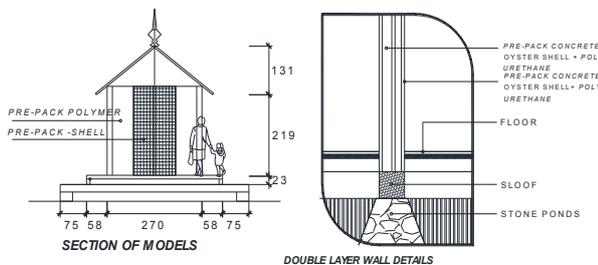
Textured Polyurethane concrete in exterior double wall panel
